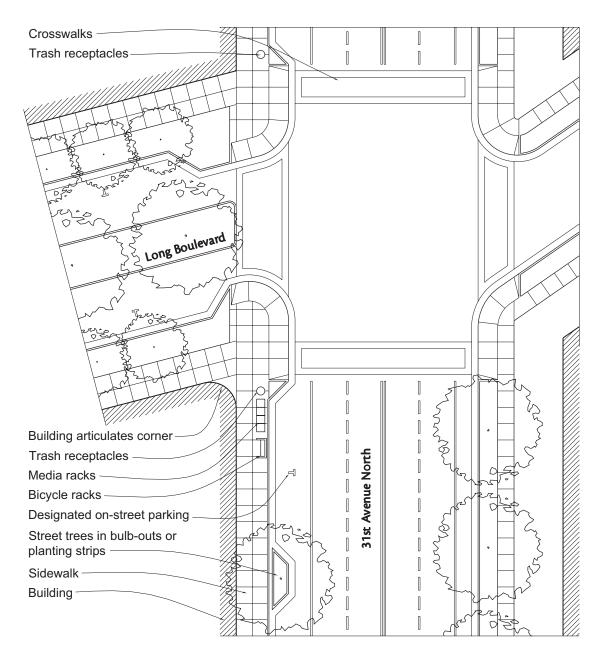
Intersection Plan - 31st Avenue North and Long Boulevard
